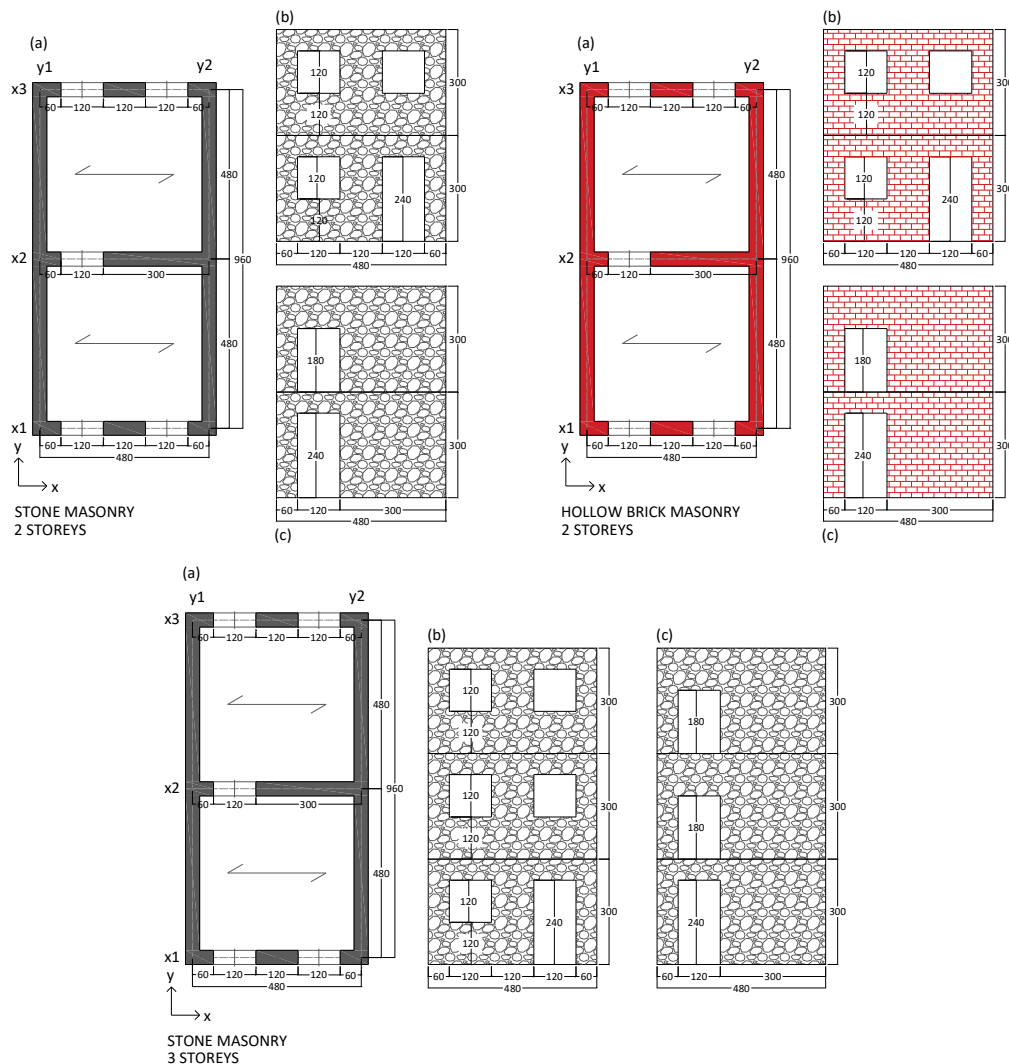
Type of basic S.U.: plan (a), front and back façades (b) and internal wall (c).
